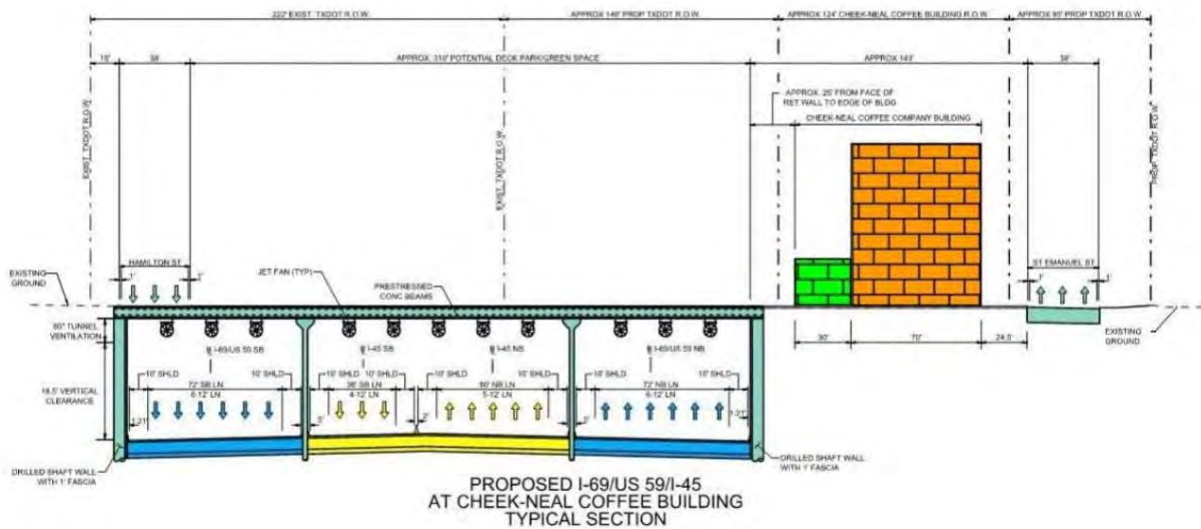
Typical section of IH 45/IH 69 at Resource 016, showing depressed freeway profile and retaining wall.
